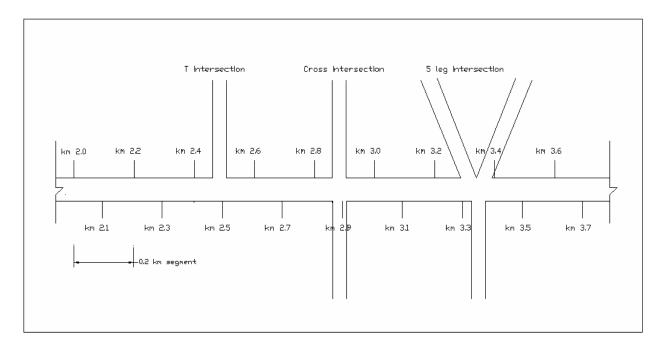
Conceptual Sketch of road section subdivision in 0.2 km elements.
